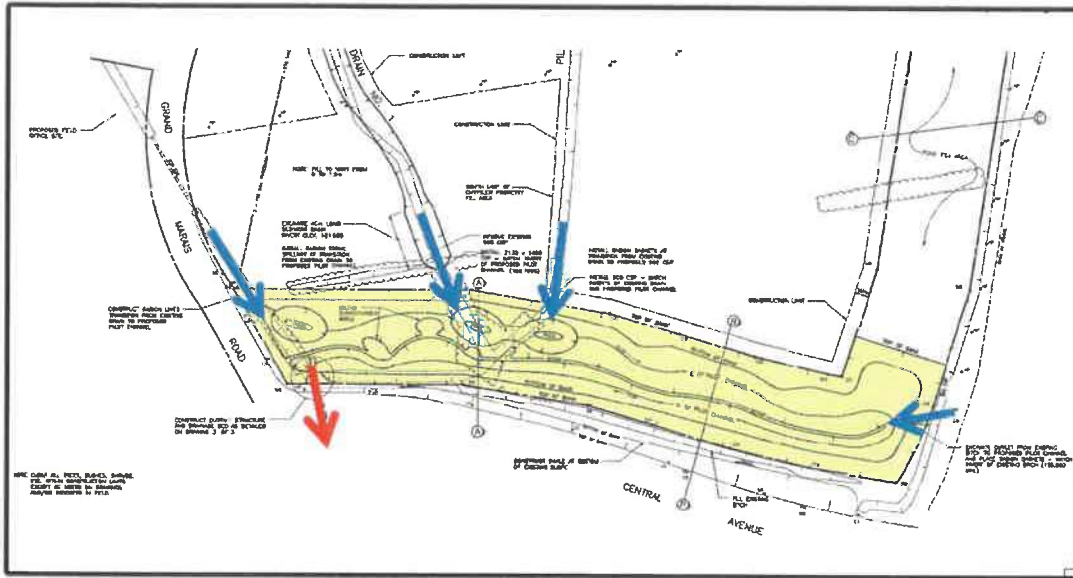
Central Avenue Pond – Pond Inlet and Outlet (red arrow) Locations
